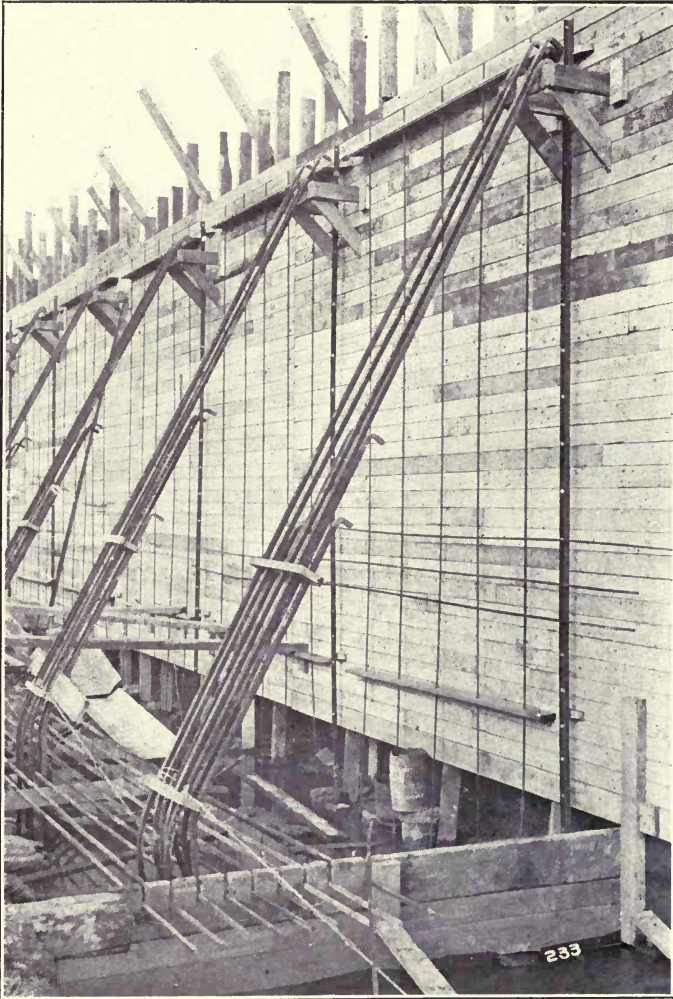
REINFORCEMENT IN PLACE, BUFFALO RETAINING WALL.
